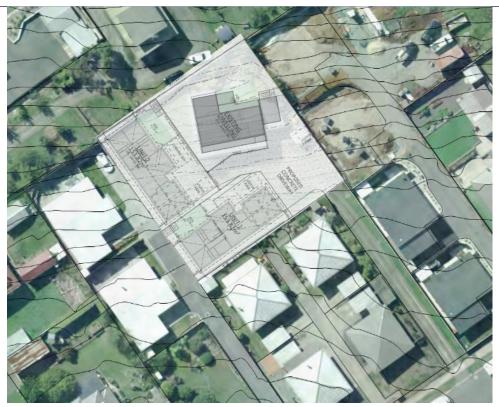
Site plan of the proposed development overlaying the aerial photo including half metre contours of the area.
